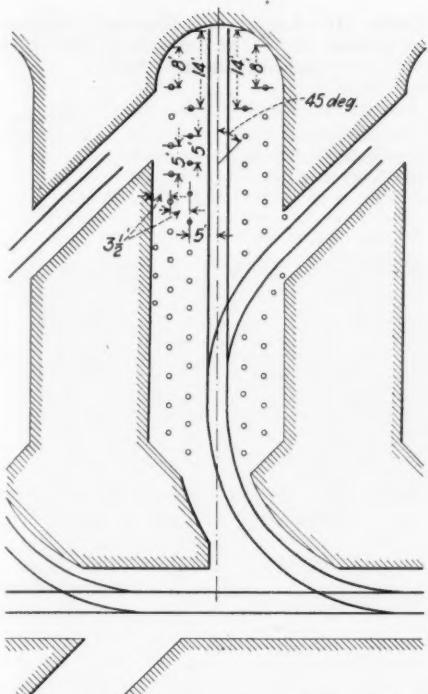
Talleydale room timbering plan. By the time a room reaches its full depth, it generally is necessary to supplement the posts with crossbars in the outbye half.
